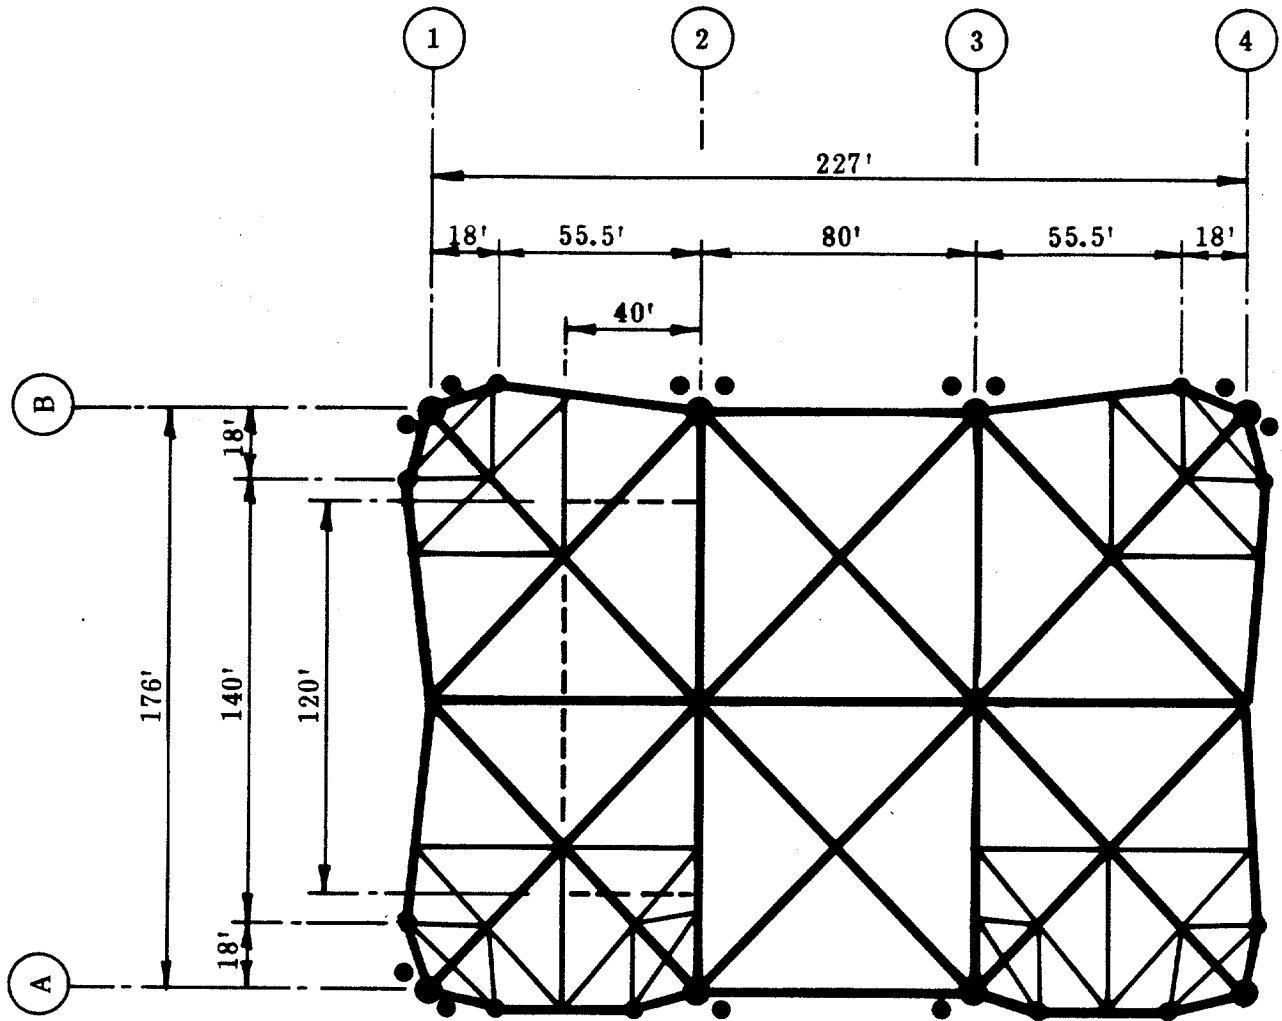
SINGLE PIECE, 150 FT WATER DEPTH PLATFORM, LEVEL 1 @ ELEVATION -150' FT
